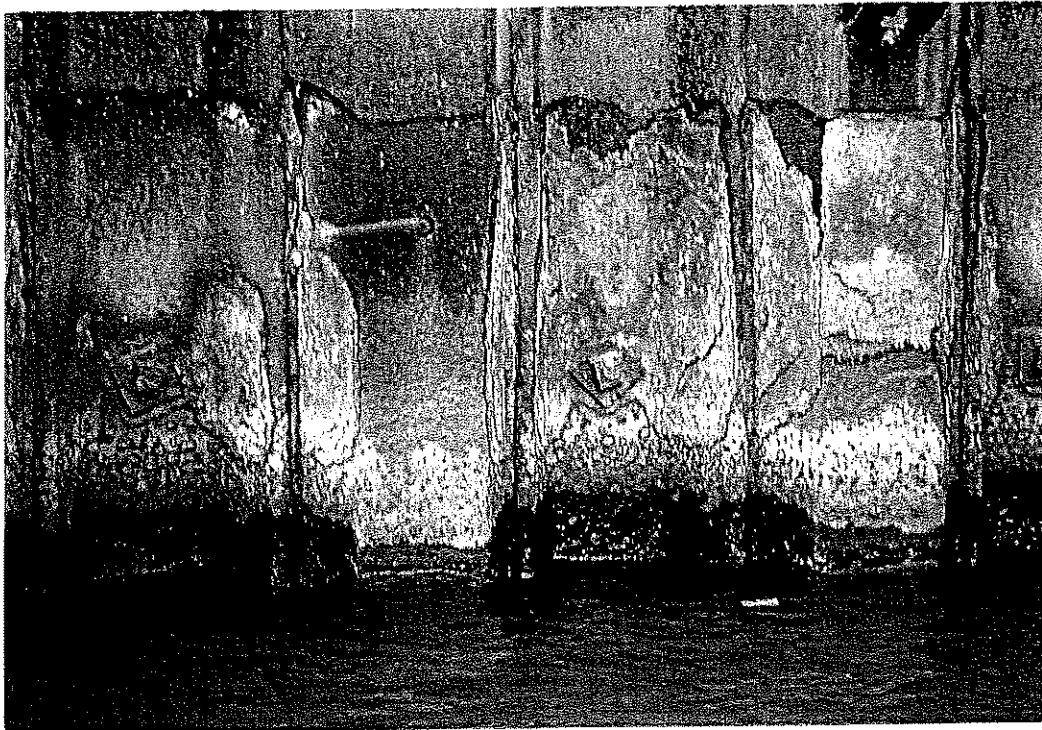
View of Typical Steel Condition, Looking Northwest from Station 3+66.
